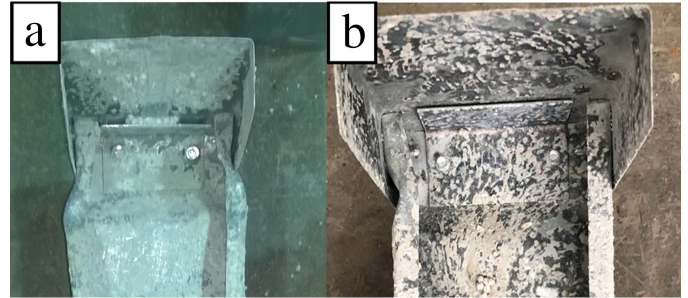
(a) Failure mode of centrally loaded specimen, (b) failure mode of eccentrically loaded specimen
